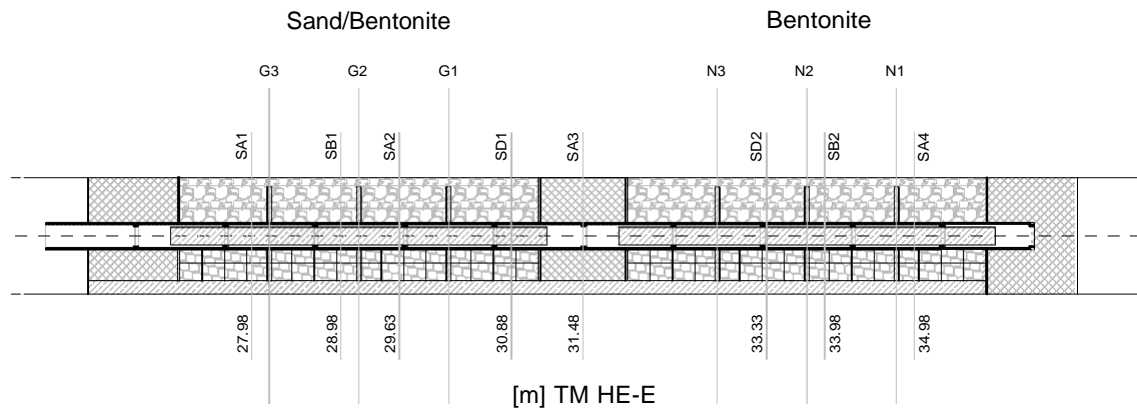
Longitudinal section of the HE-E showing the instrumentation cross sections /GAU 14/
